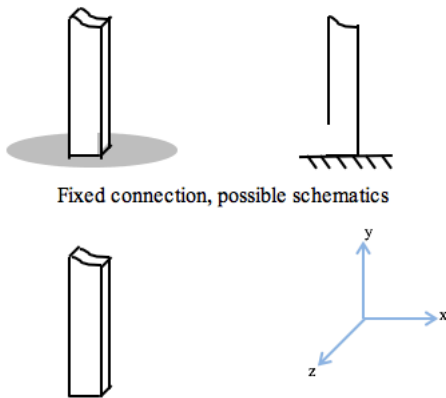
Fixed connections are key to any cantilevered member, whether it is a horizontal or vertical member.
